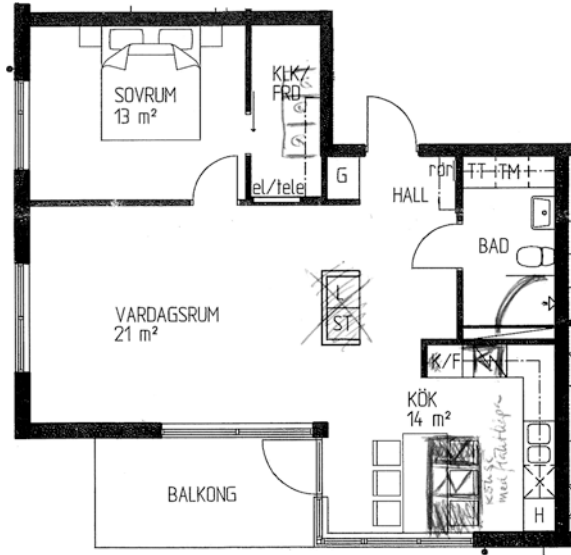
shows an example of layout of apartment in Case D, where the owner-occupiers have drawn their changes to the original layout. The owners have removed a cupboard unit, and thus also changed the whole floor cladding, originally designed to create a separation between kitchen and living room for better sight between the two spaces.
